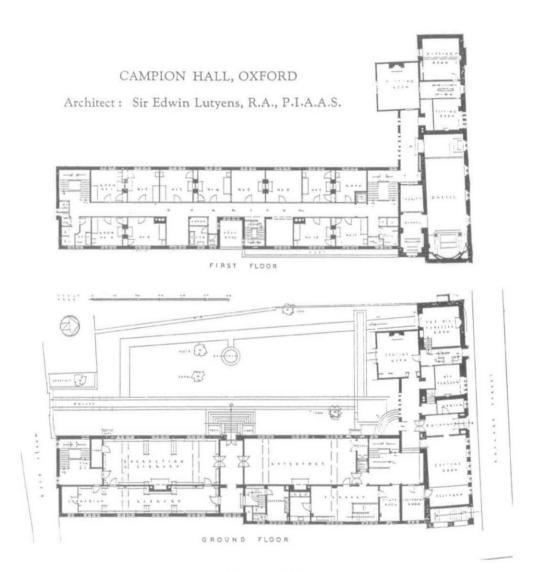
Ground plan and first floor plan of Campion Hall (The Architect and Building News, 26 June 1936).
